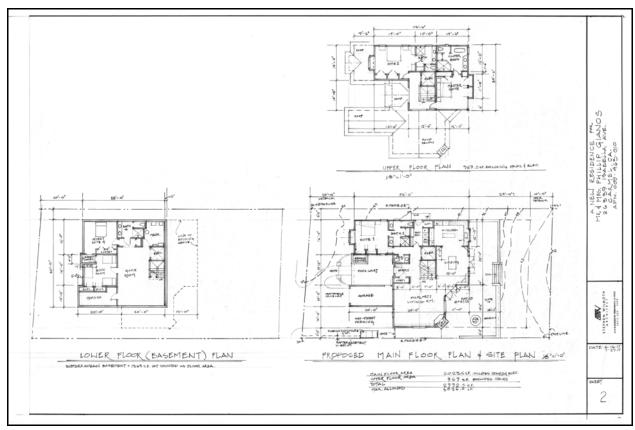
Floor Plan: Proposed floor plans for the new three-level single family dwelling
